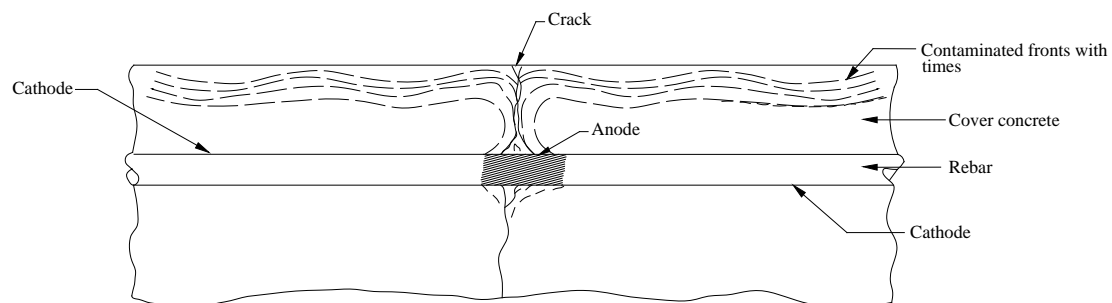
Depassivation of the rebar near the crack (adapted from Bentur et al., 1998)
